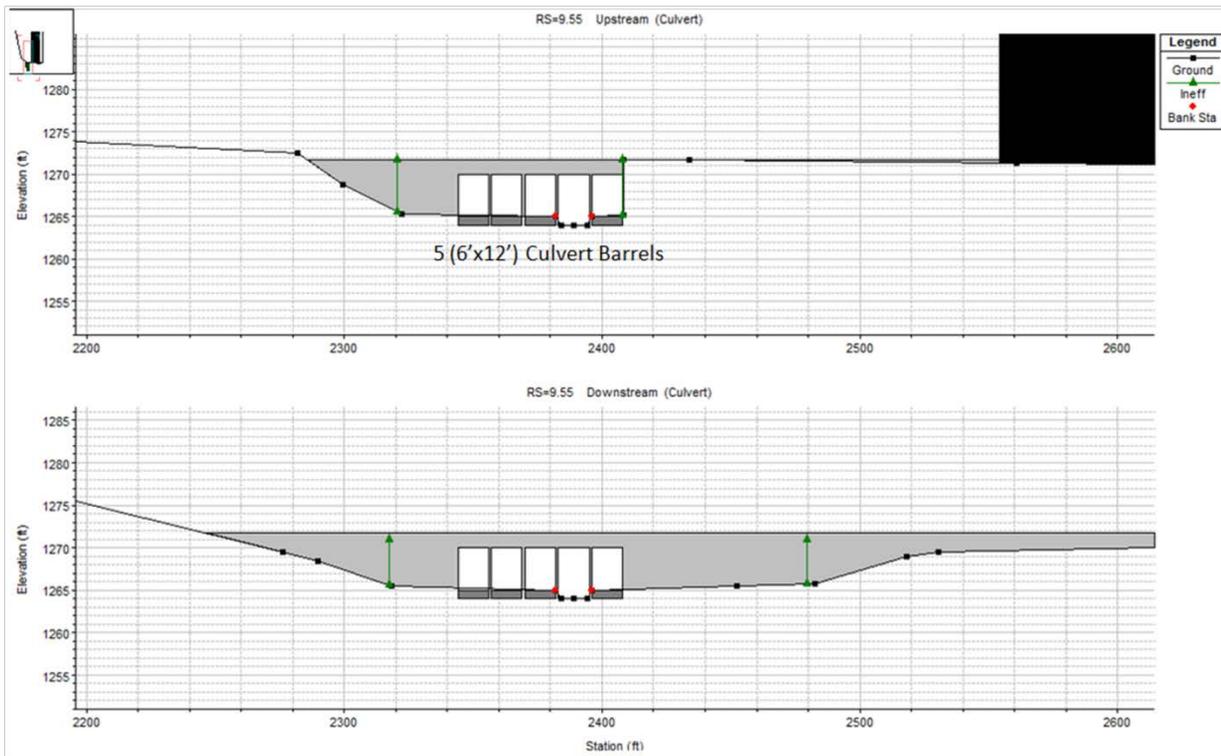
Cross-Sections of Design Option 2 for Culvert 5722
